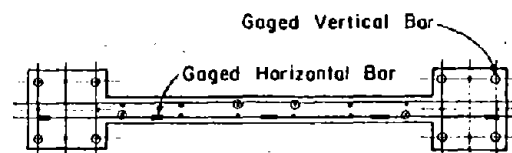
Strain Gage Locations in Elevation of Test Specimens
